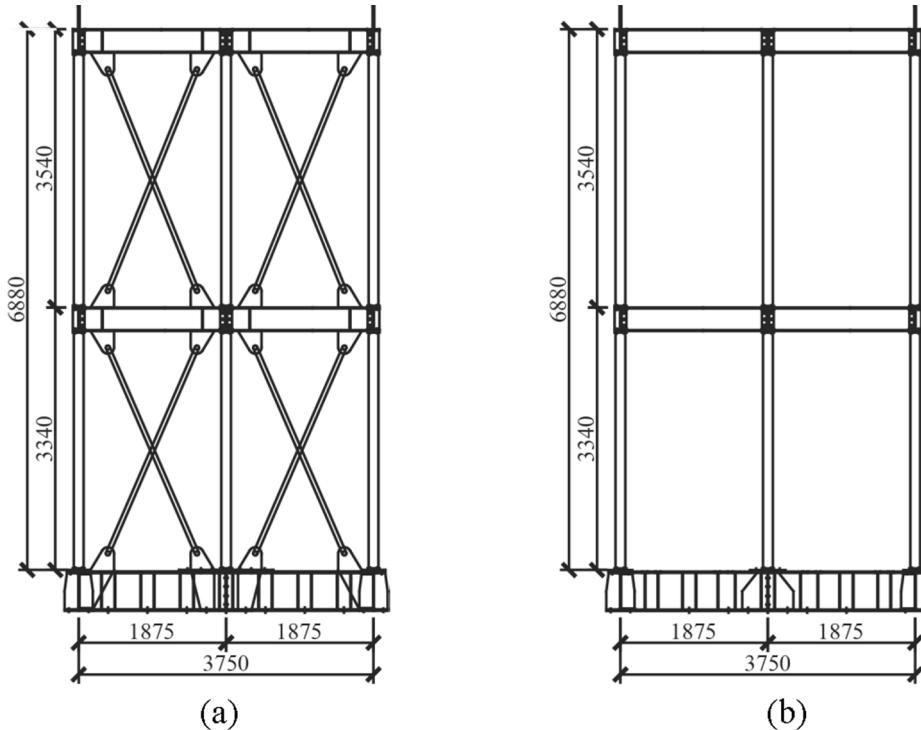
Elevation view of the test structure in the Y direction: (a) braced perimeter bay; (b) unbraced interior bay.
